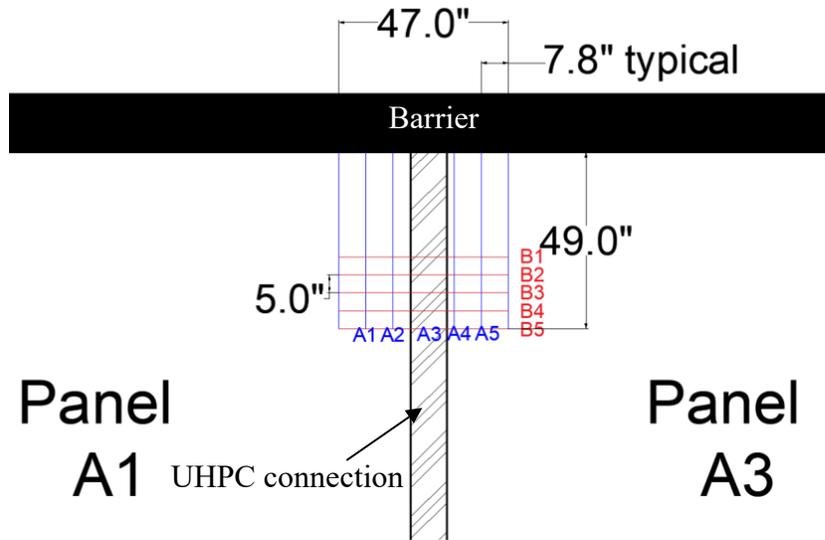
Plan view of the bridge showing GPR scanning location. Scan direction is from A1 to A5 and from B5 to B1.
